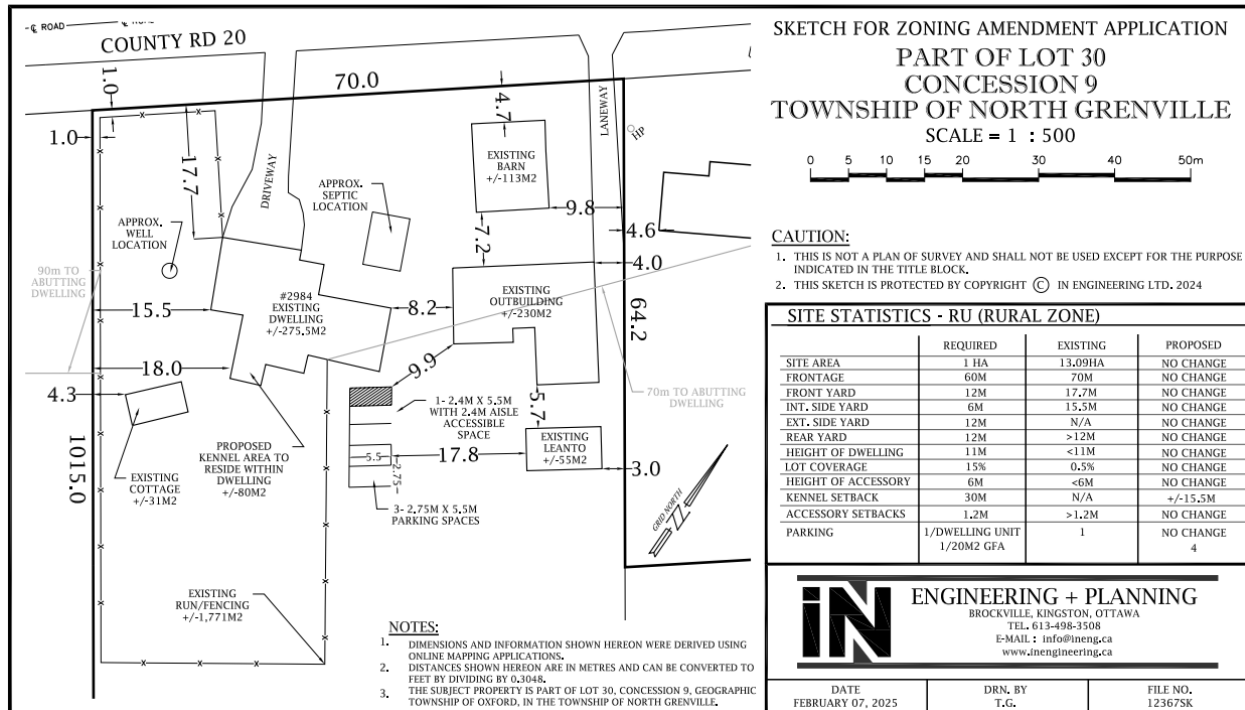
Site Plan – Existing Buildings and Proposed Uses
